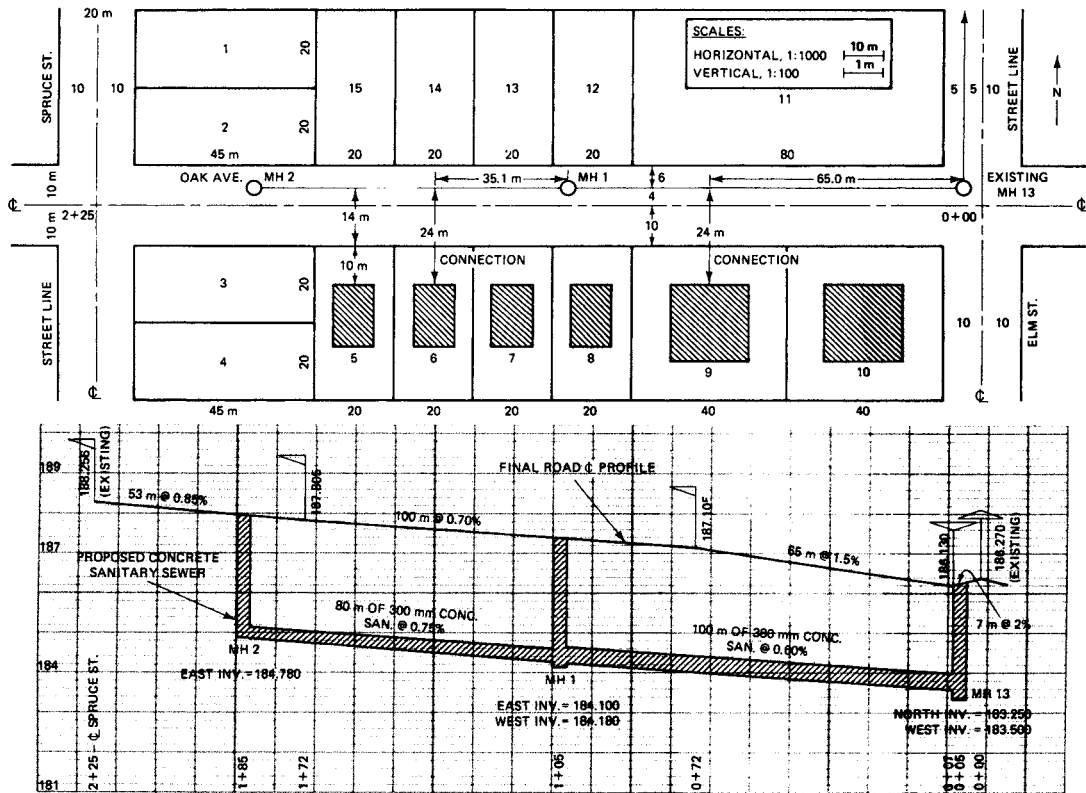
Plan and profile of Oak Avenue (metric units). See also Figure 13.18.
